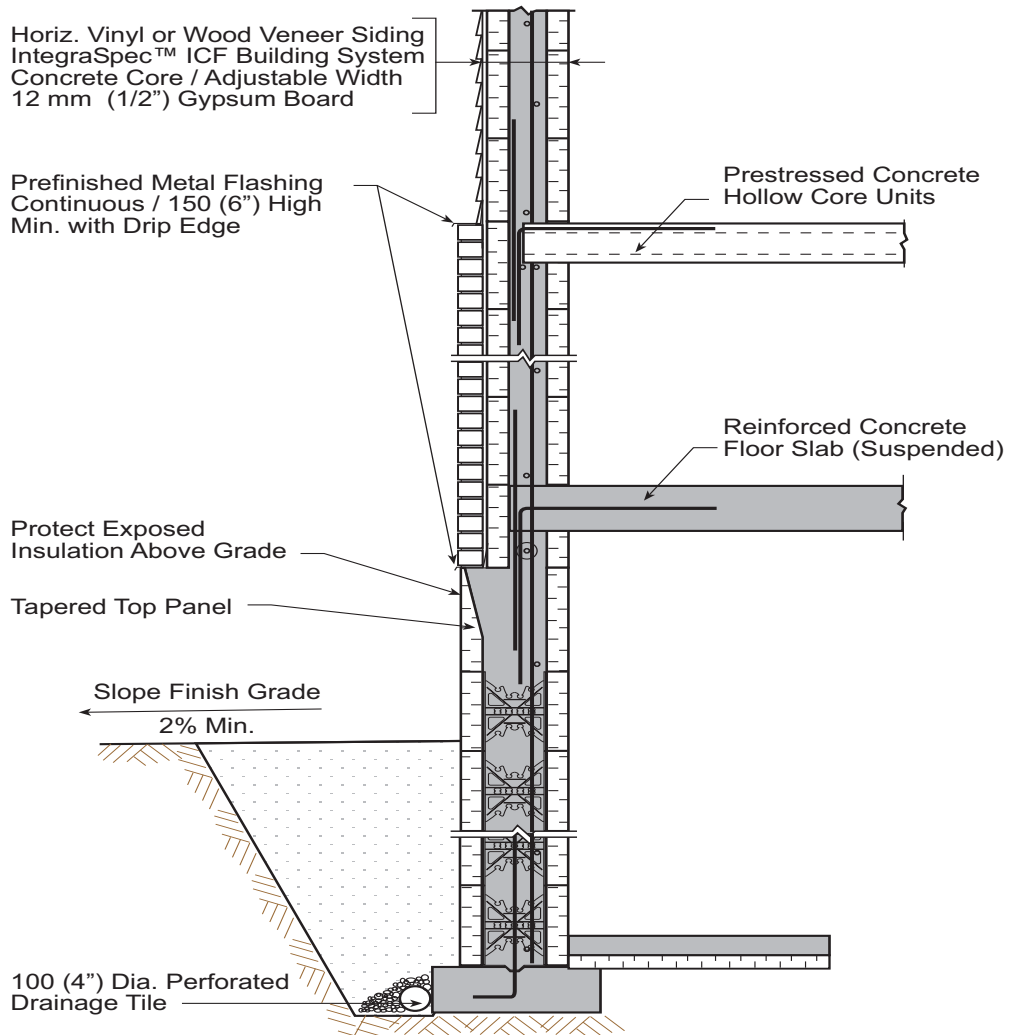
Typical section of “IntegraSpec®” wall system supporting brick, stone or concrete veneer.
